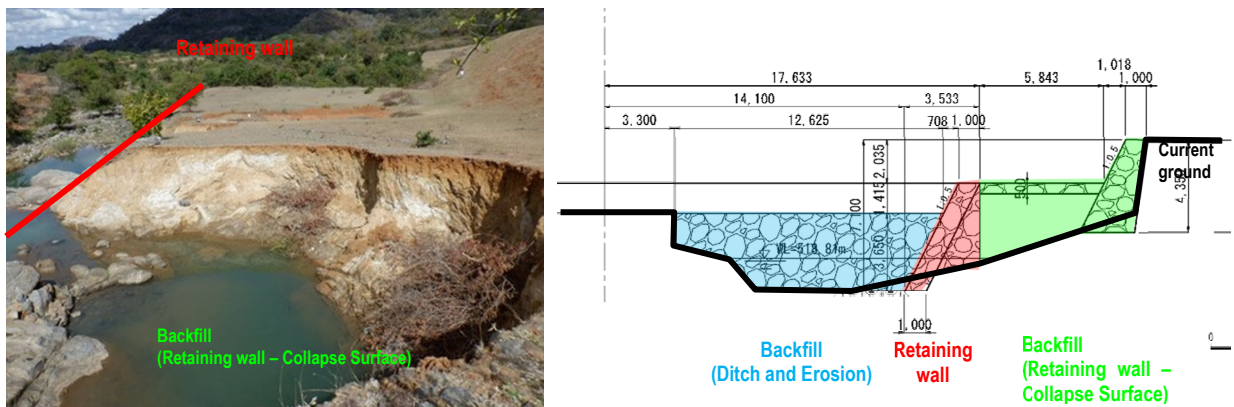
Emergency Repairing Measures on Right Bank Side Wall of the Connection Canal
